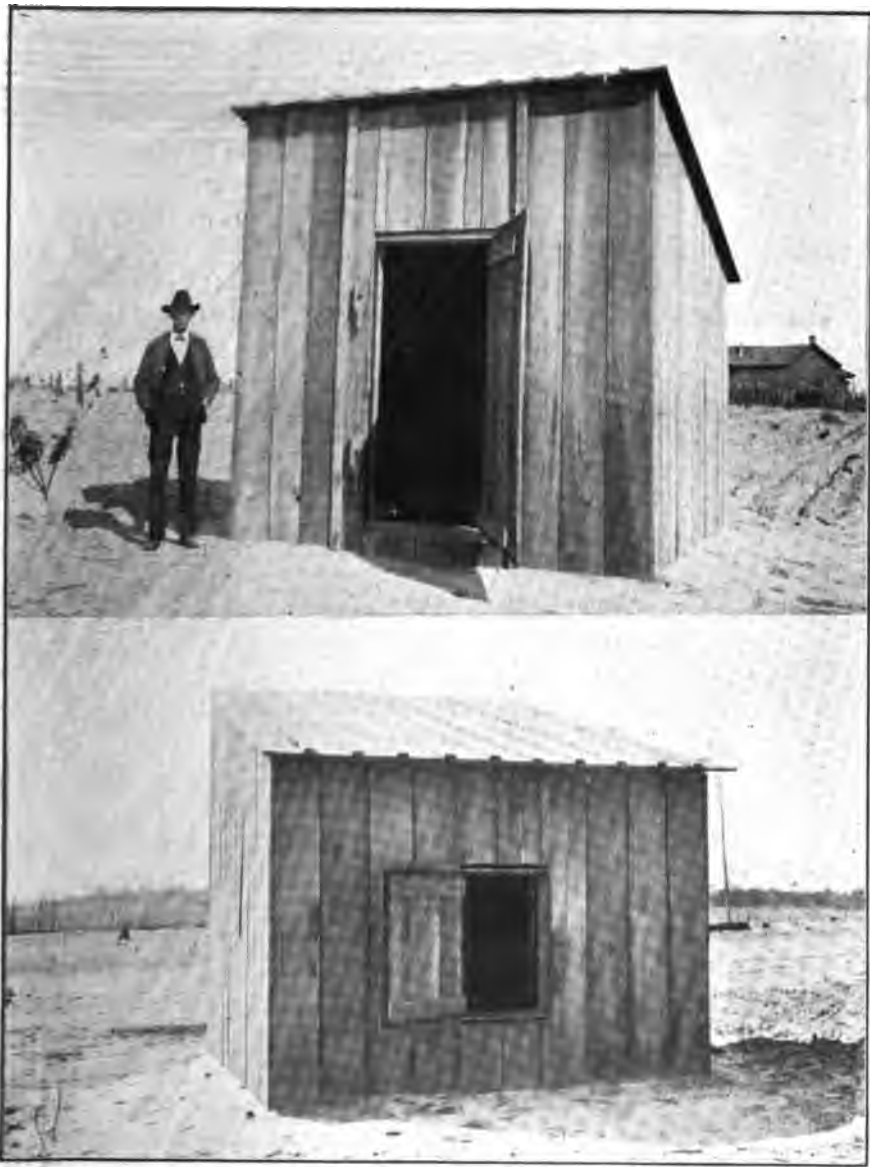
Front and rear views of fumigating house built by Bond Bros., Roberta, Ga.
